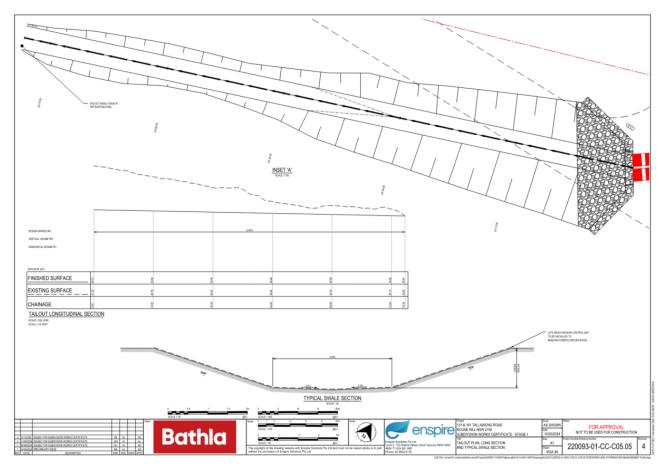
Details of the tail out channel plan provided in Bathla Subdivision Works Certificate (2024).
